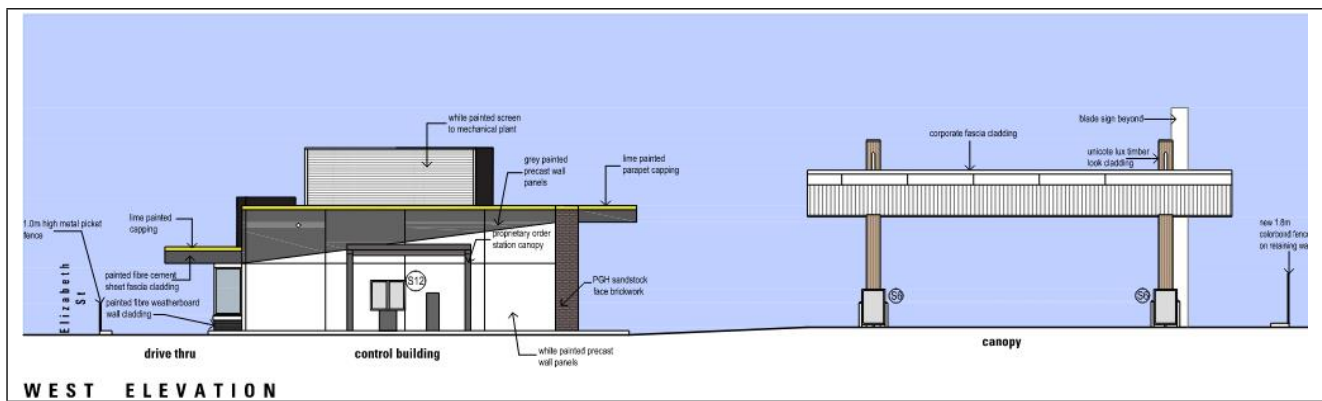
Western elevation of control building and bowers (Source: Ratio)
